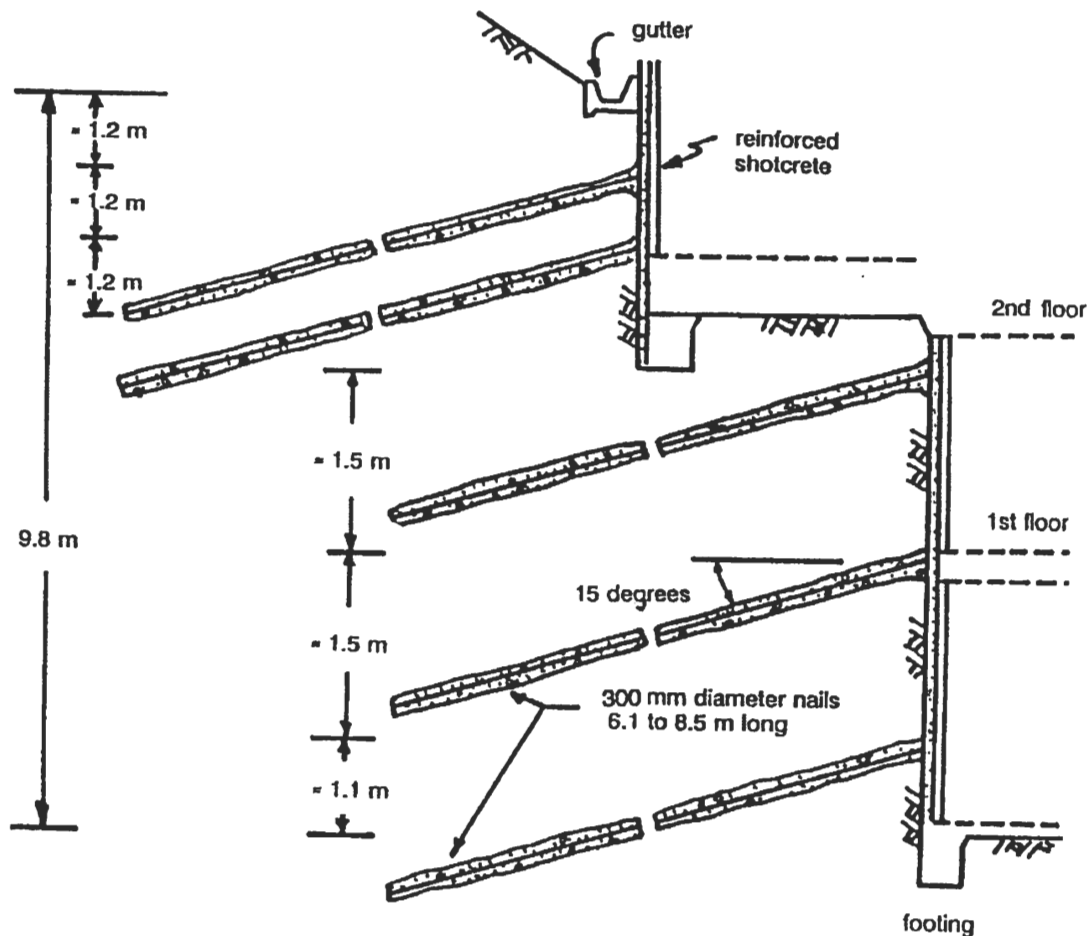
Cross section of a soil-nailed retaining wall constructed on a steep hill in San Francisco (CVA wall), Calif., to provide adequate space for an apartment complex (Felio and others, 1990).
